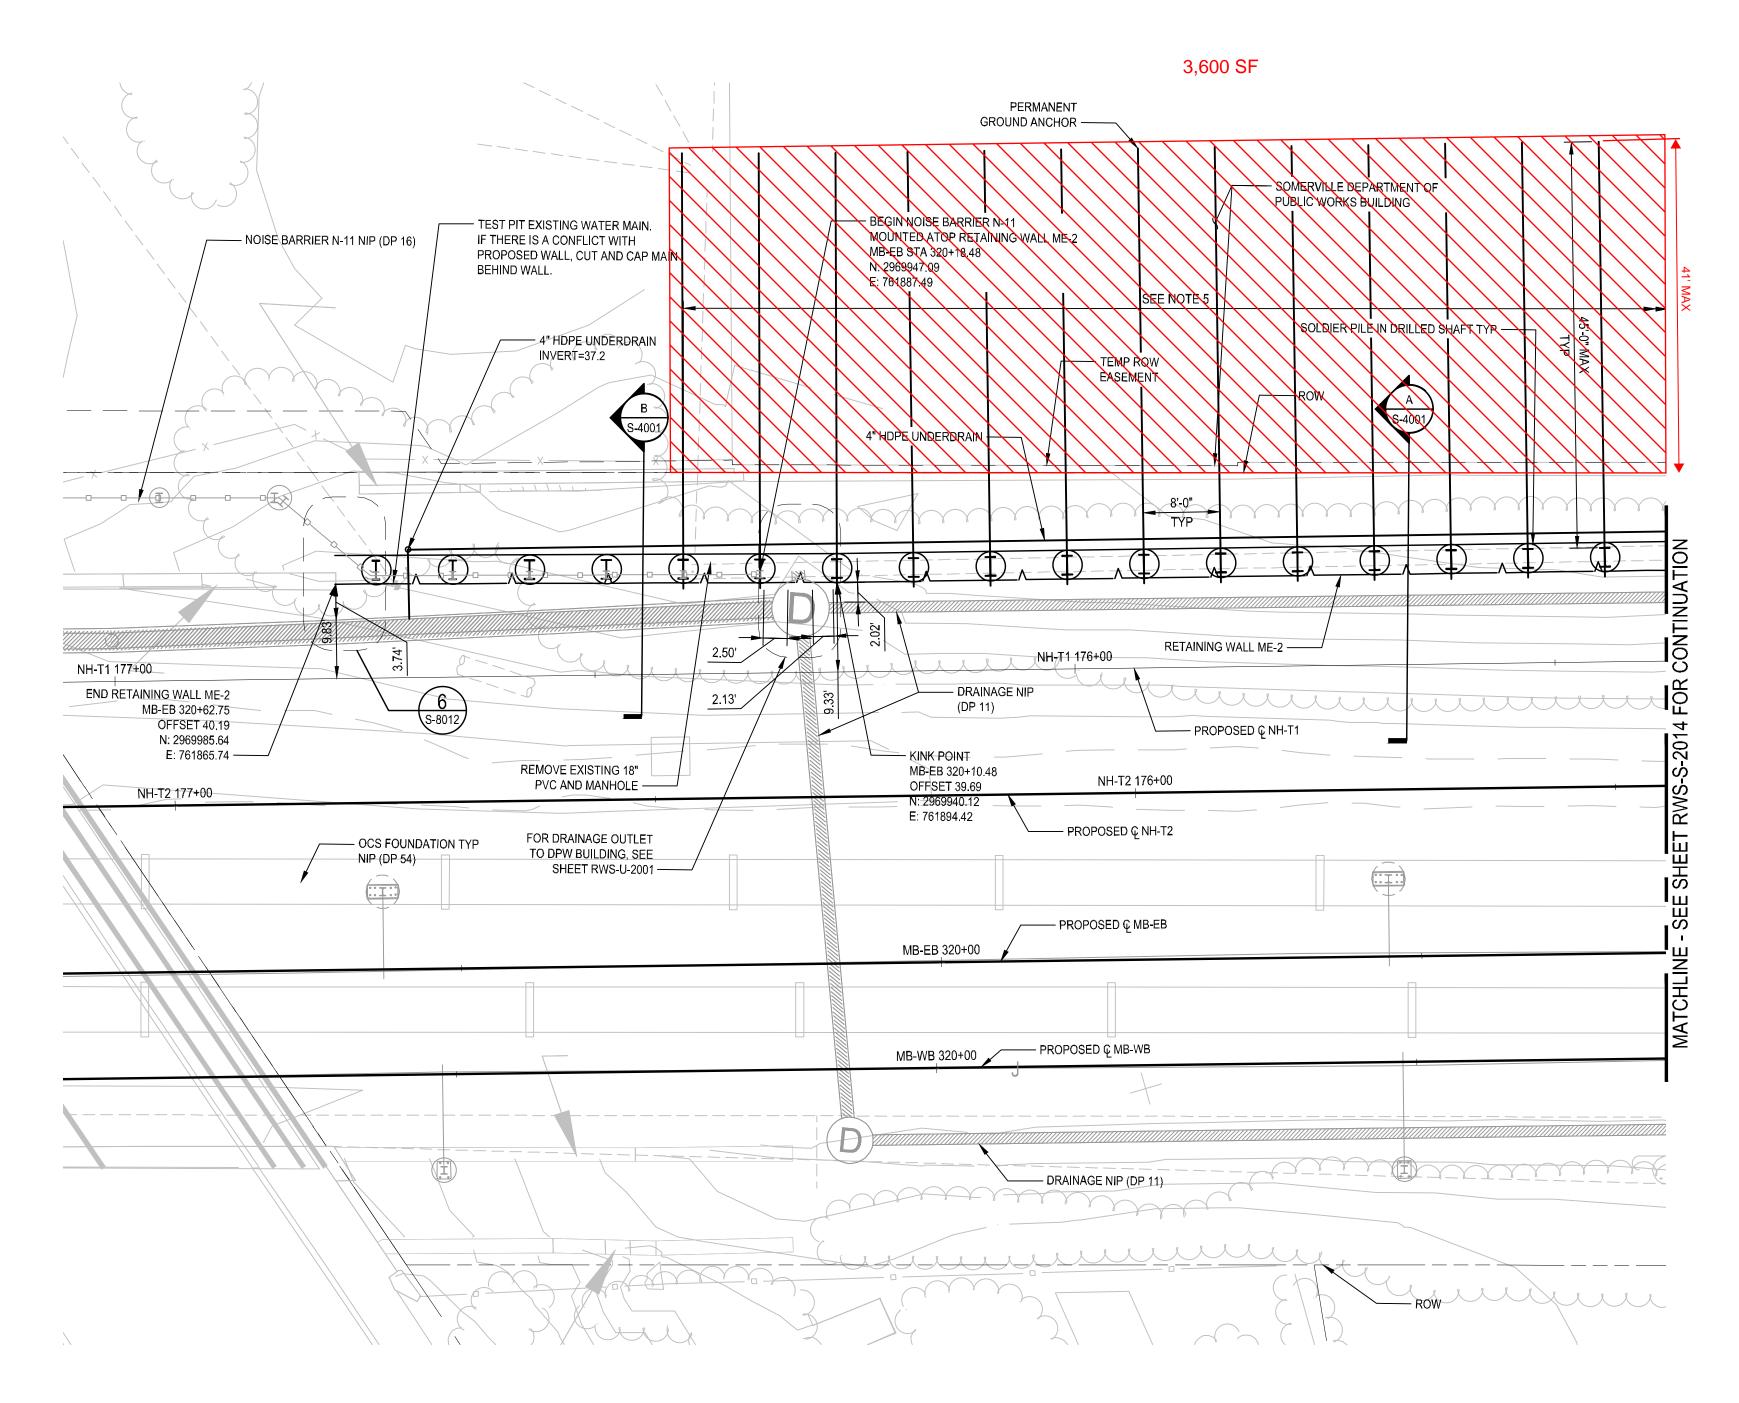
EXHIBIT D - CONCEPTUAL DRAWINGS OF ENCHROACHMENT OF DPW FACILITY ON MBTA ROW SHEET 2 OF 5
